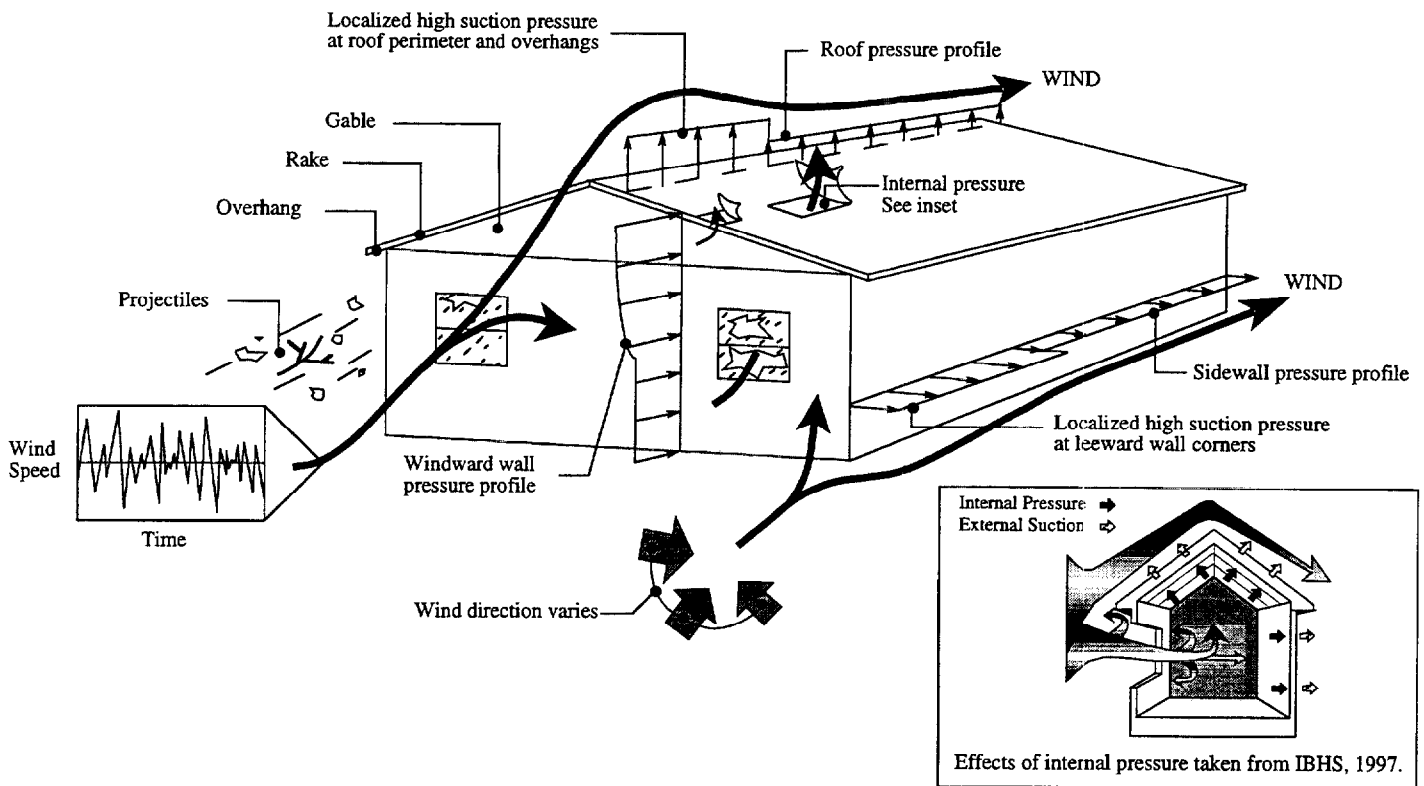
Wind Effects on Low-Rise Buildings (after NAHB, 1993).
